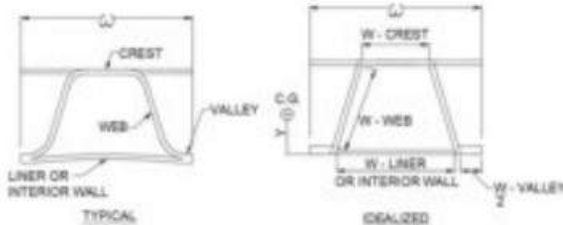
1—Typical and Idealized Cross-section of Profile Wall Pipe
